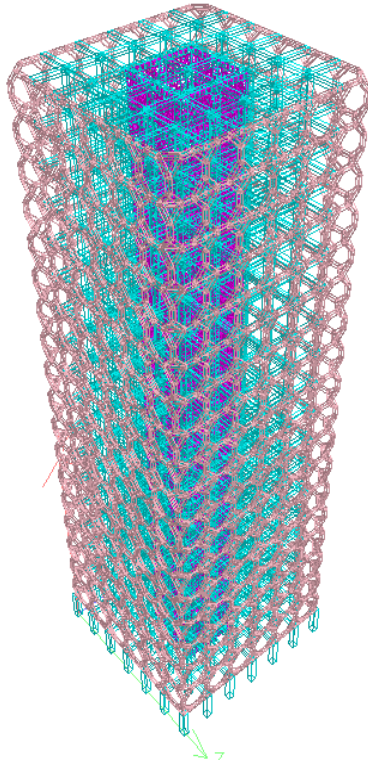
Wireframe view of shear wall+3m Octagrid module building
